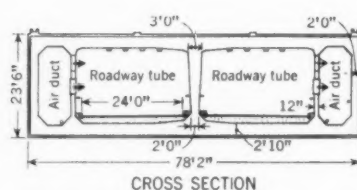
Uniform cross section was used throughout entire length of tunnel. On each roadway, ventilation air is drawn out of tunnel for first half of the length, then fresh air is forced into the roadway and pushed out of exit by vehicle movement.
